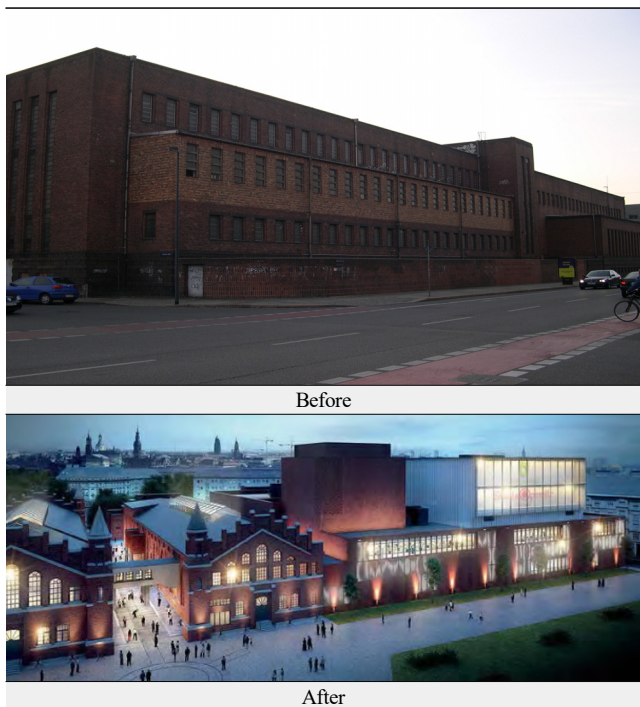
Reconstruction of Heizkraftwerk Mitte [19]
